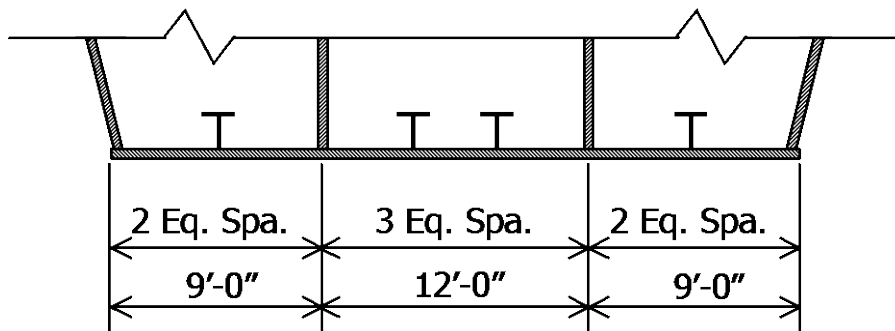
Longitudinal Stiffener Arrangement, Proposed Design
